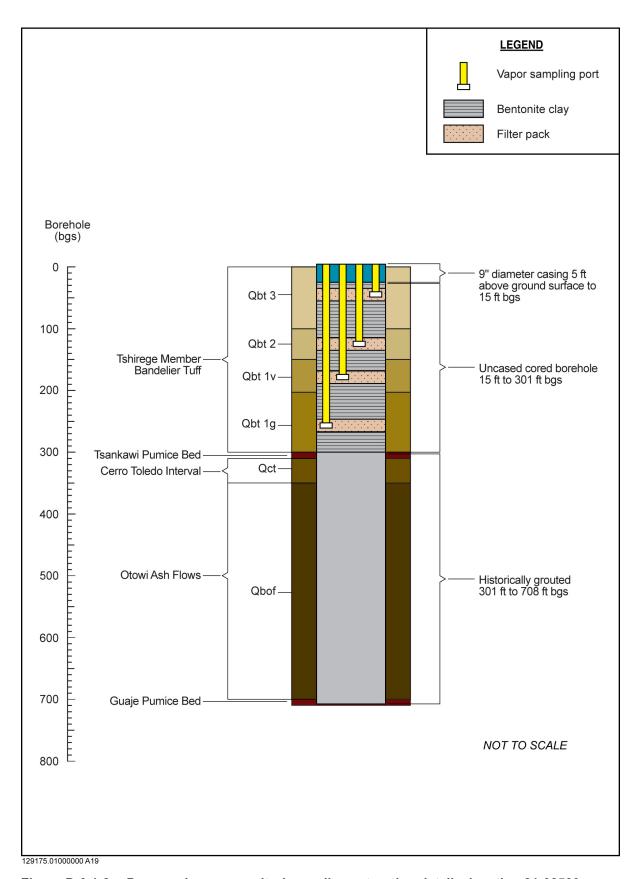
Proposed vapor-monitoring well construction details, location 21-02523
